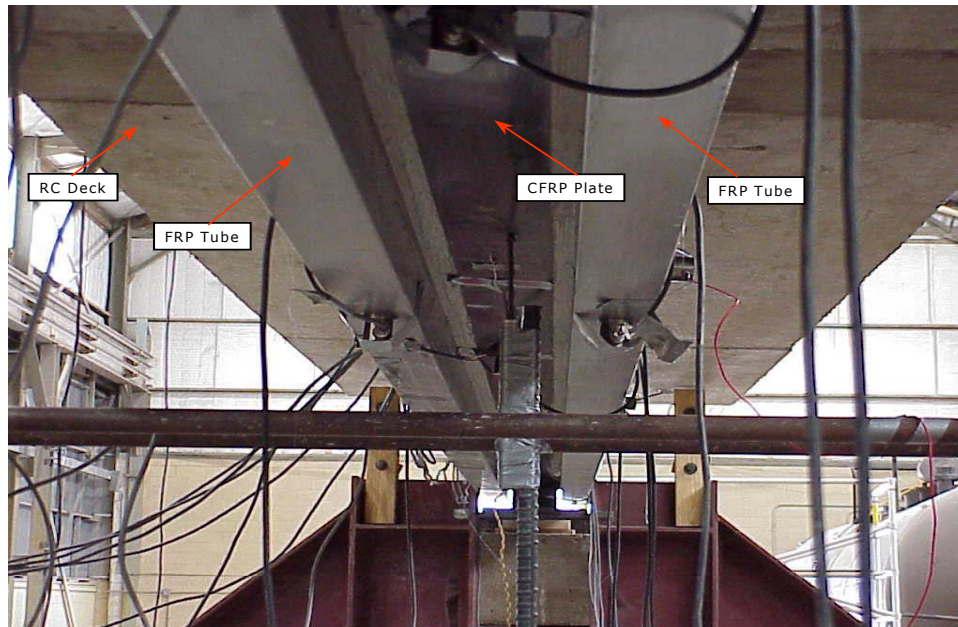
FRP Pultruded Girder End View and Elevation.
